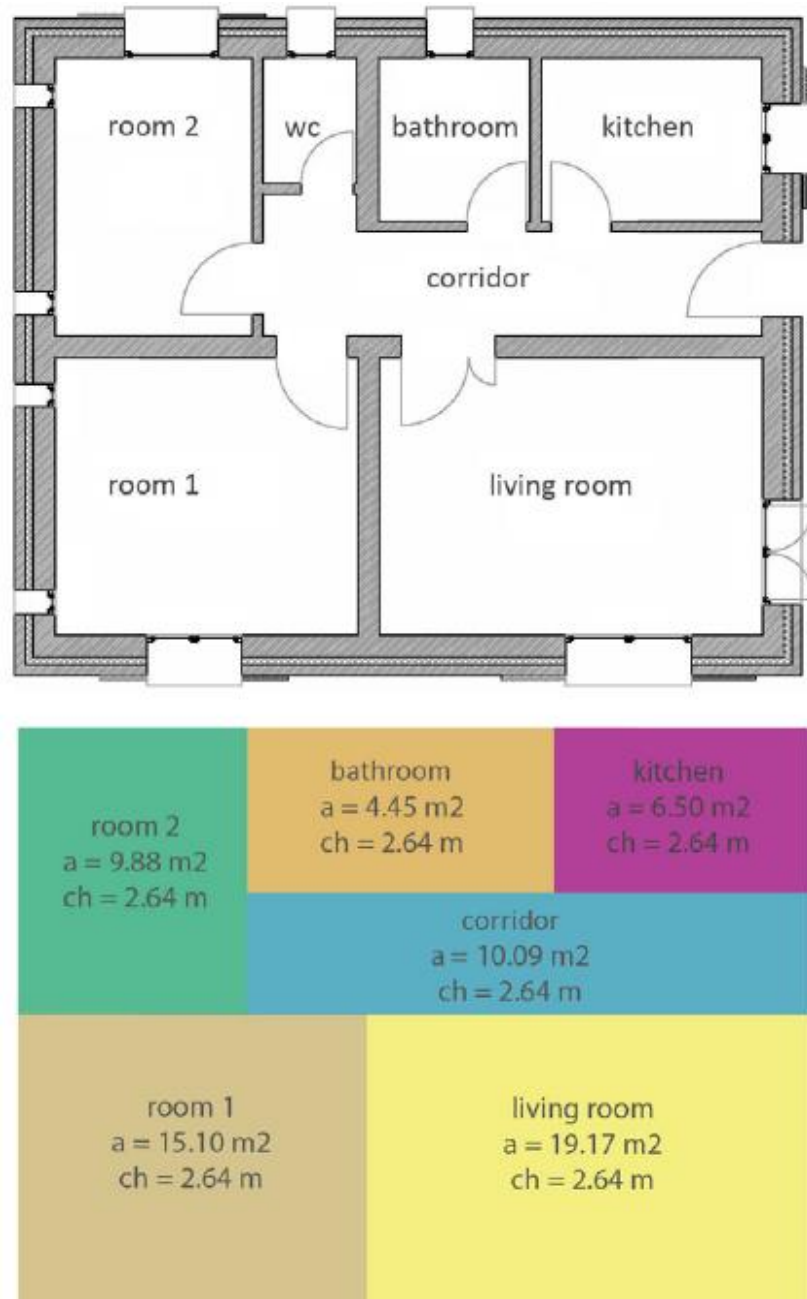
Architectural Layout and Dimension of the Reference Building.
